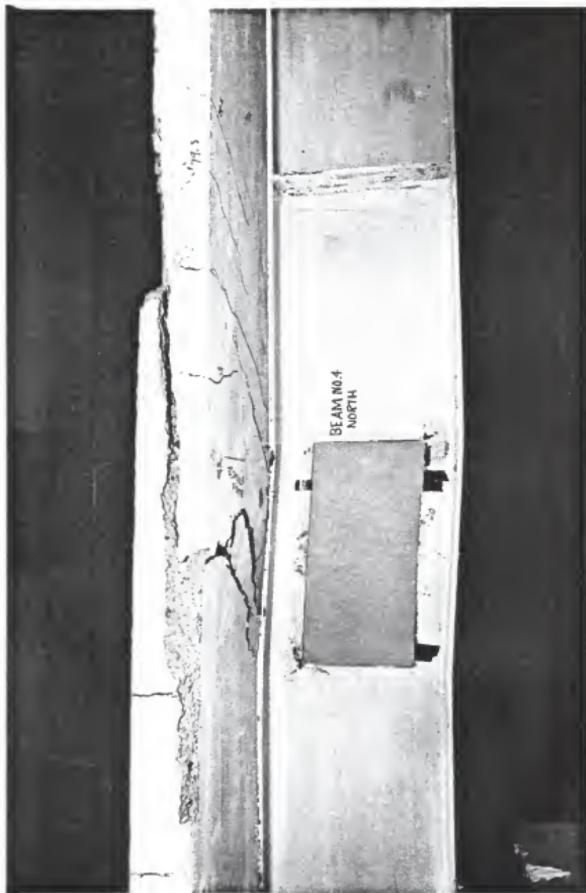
Crack Pattern of Prototype Beam Slab
